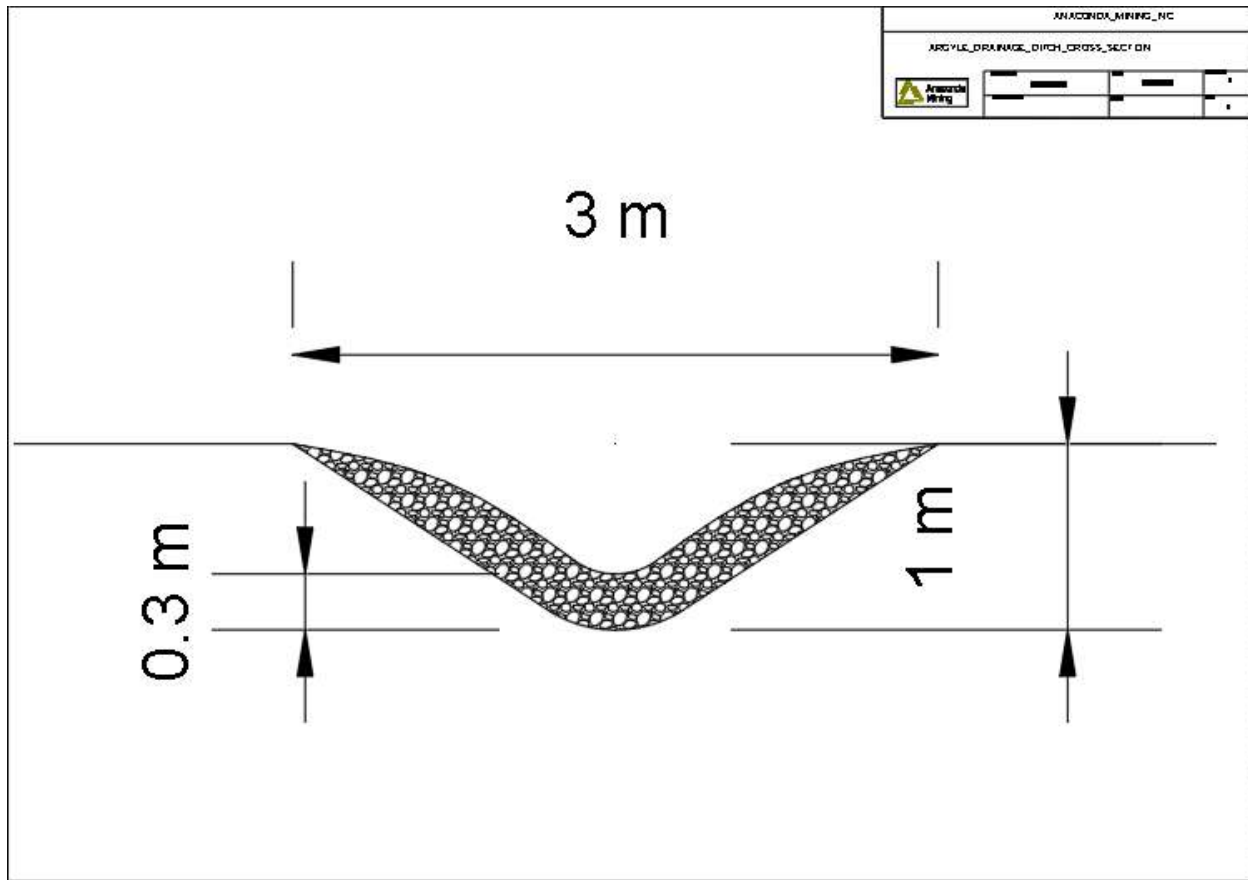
Cross Section of Typical Proposed Drainage Ditch
